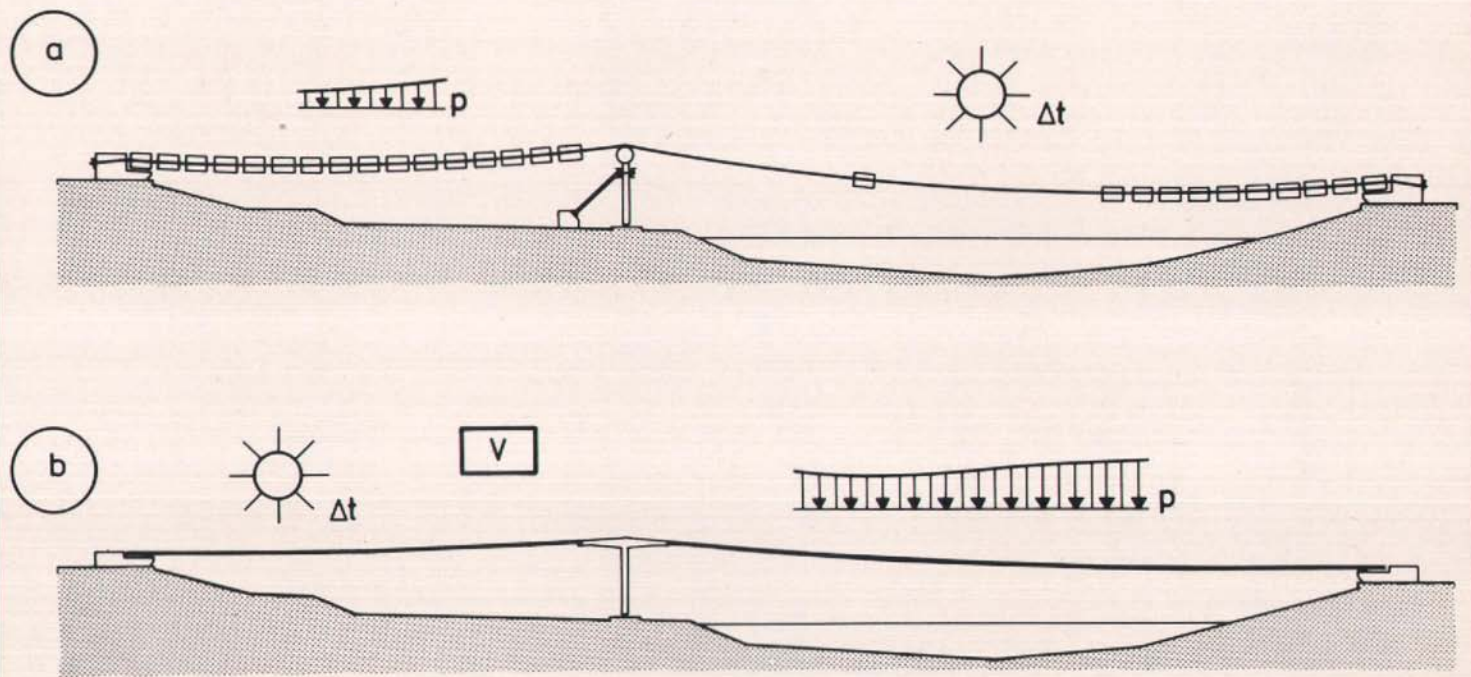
Static action on pedestrian bridge: (a) erection stage; (b) service stage.
